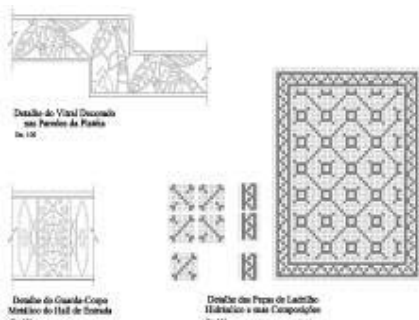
Details of tiling, wall finishing and railings (IBA, 2004)
